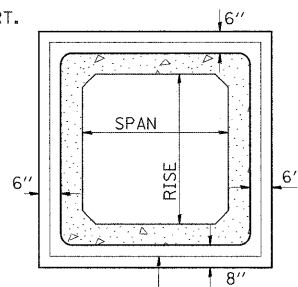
DETAILS OF CONCRETE COLLAR FOR PRECAST BOX CULVERT
